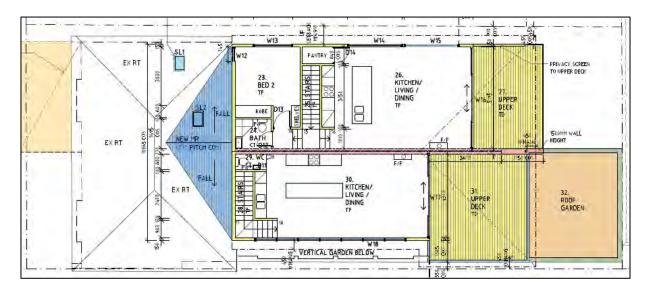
Refused first floor plan under DA-114/2021 (Source: Edifice Design, 2021)
